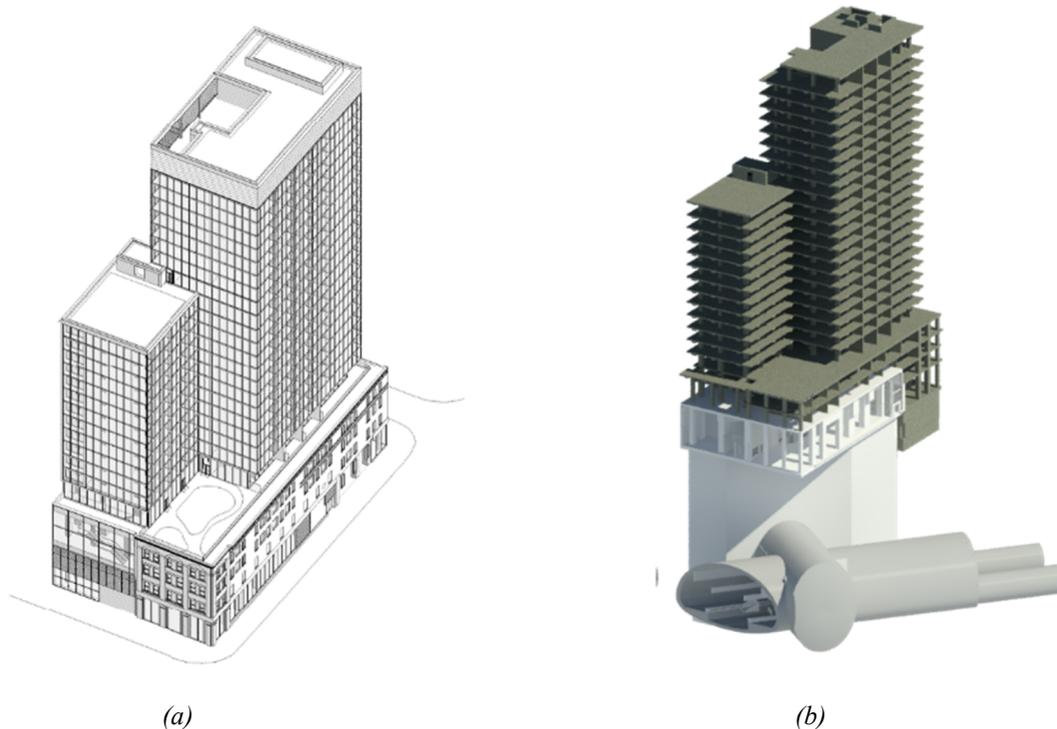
3D view of 27 storey TOC overbuild and 3 storey transit station: (a) Architectural rendering, (b) Structural rendering with TOC structure (in gray) and station elements (in white).
